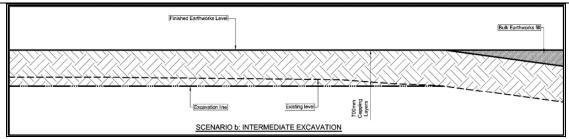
Intermediate excavation scenario (source: Walters, 2020)
